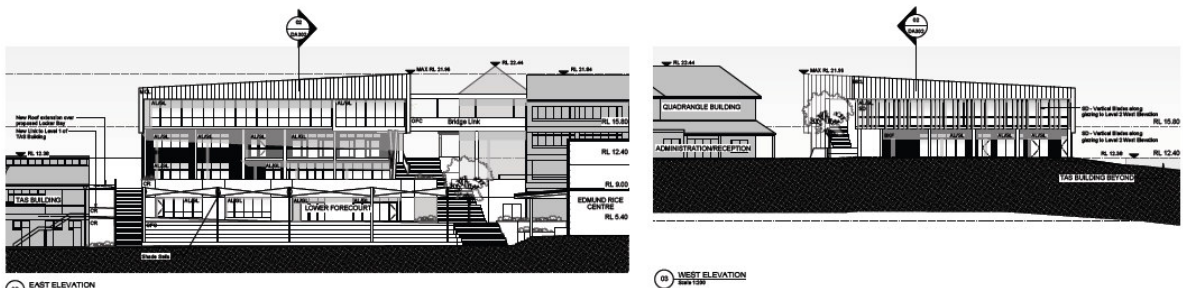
Elevations showing height relationship with adjoining school building (existing quadrangle building)
